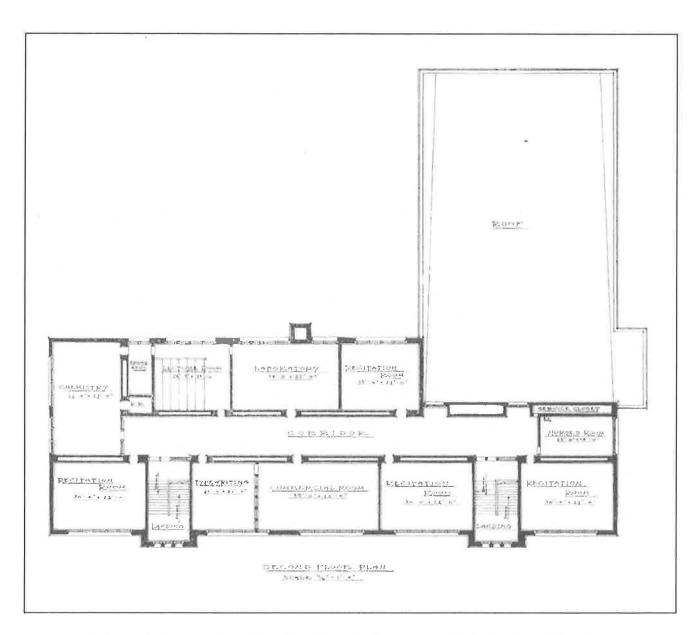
Second Floor Plan from Twenty-five Years of School House Planning
